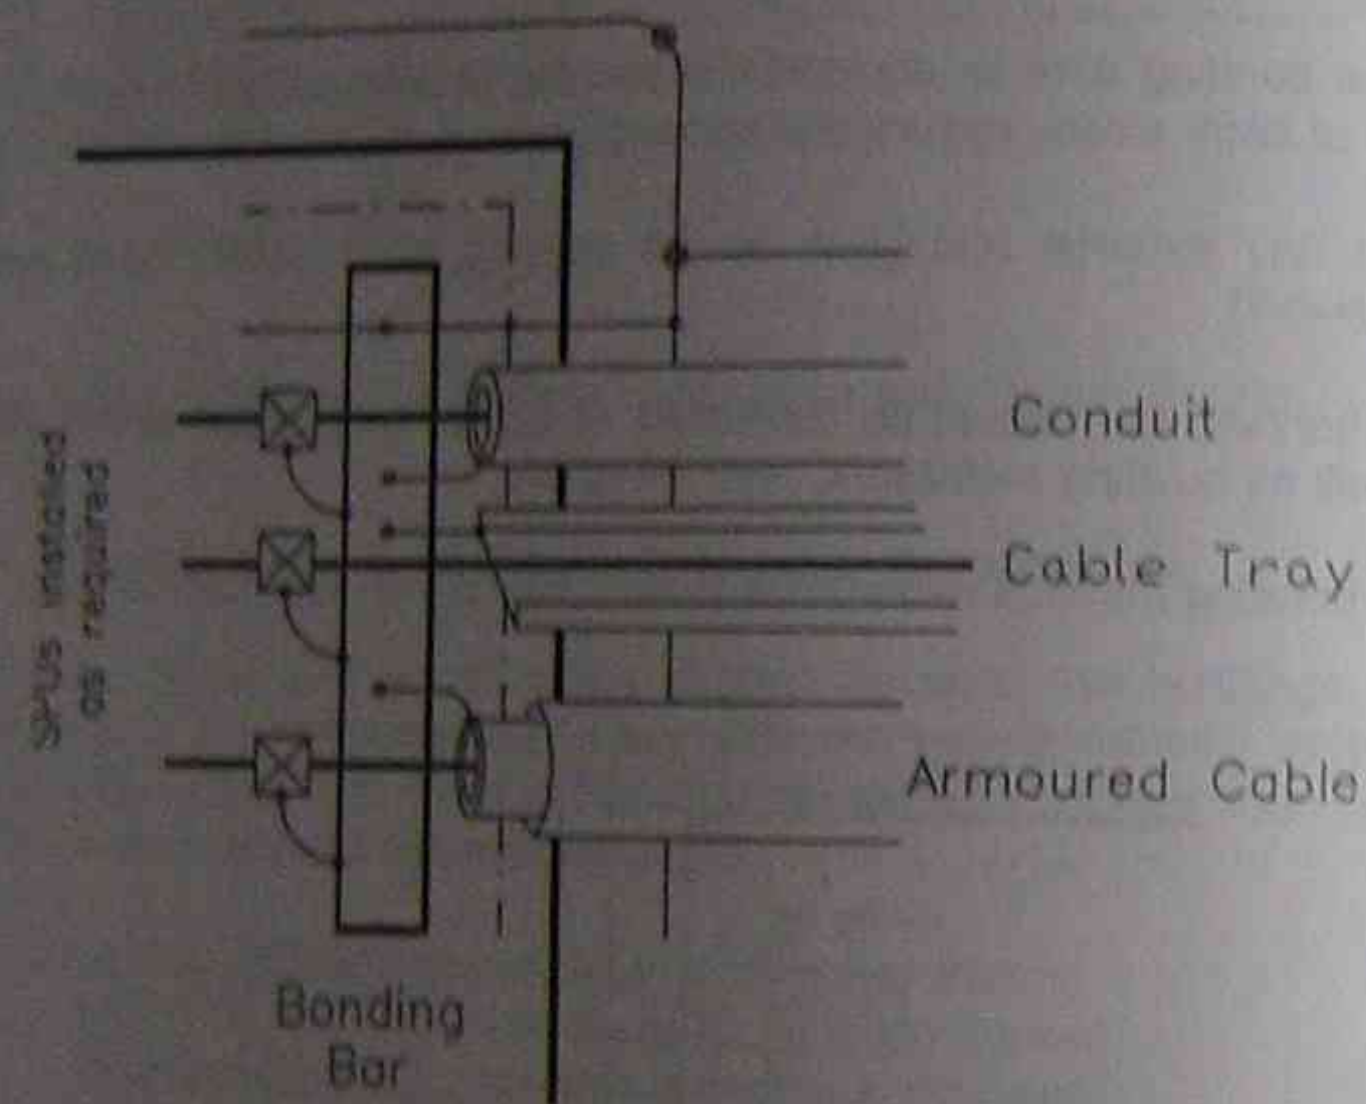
Bonding of Conduits, Cable Ladders and Cable Armouring
